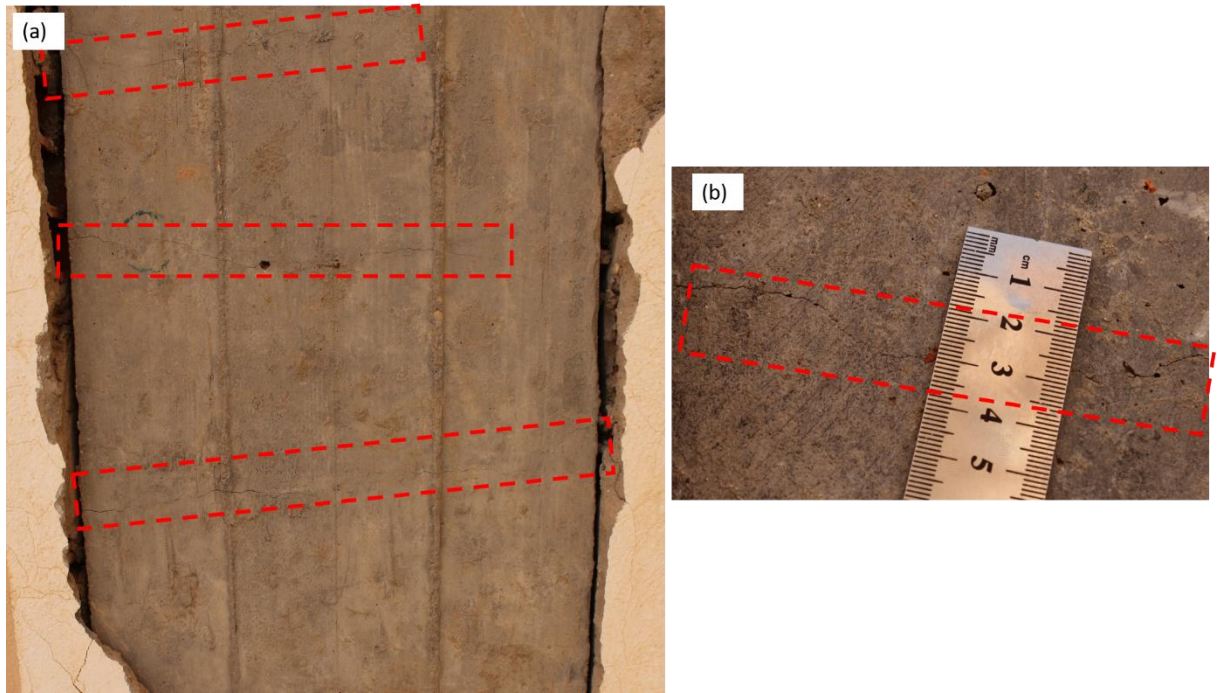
Horizontal column cracking recorded: (a) on the building 1 of area 1 ;(b) on the building 4 of area 3.
